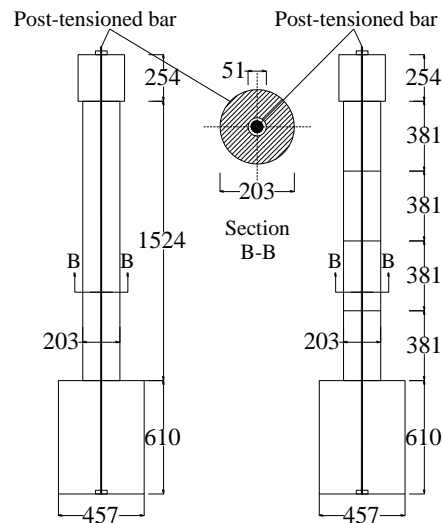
Schematic drawing for the two piers used for the calibration of the FE model (Dimensions in mm)
